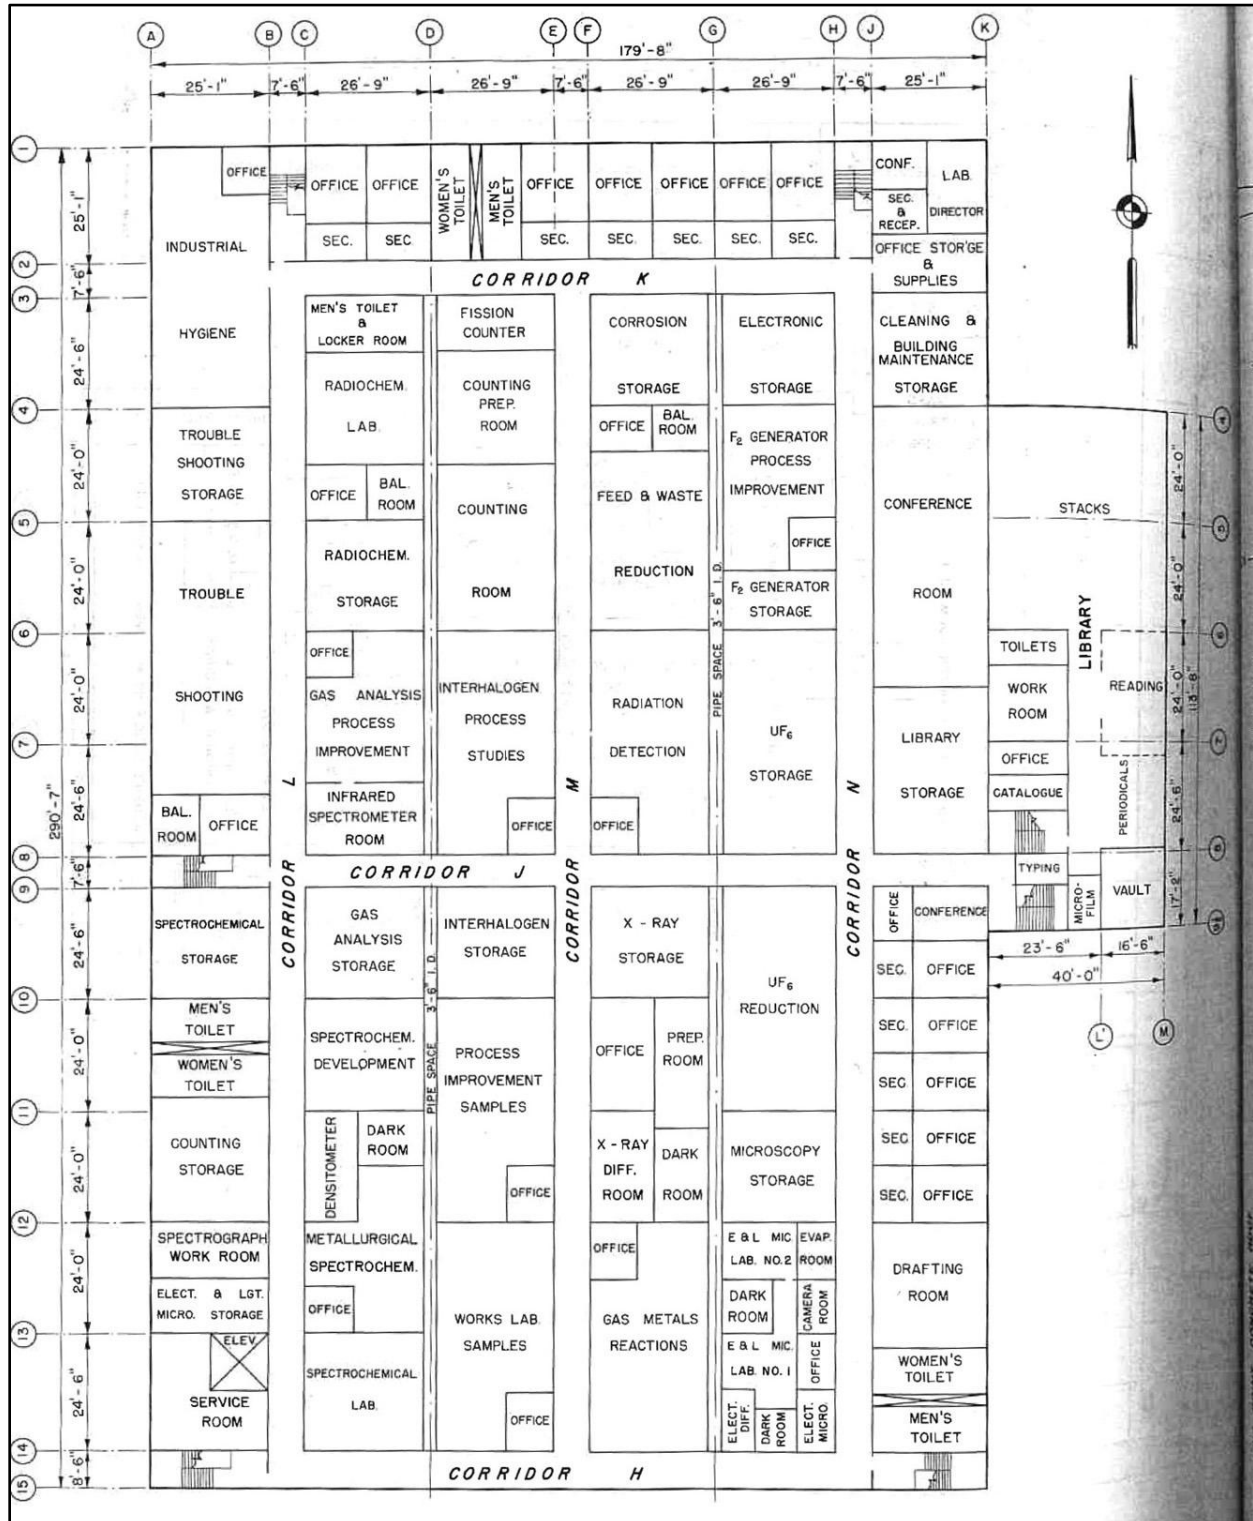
Second Floor Layout of the X-710 Technical Service Building, Circa 1956
